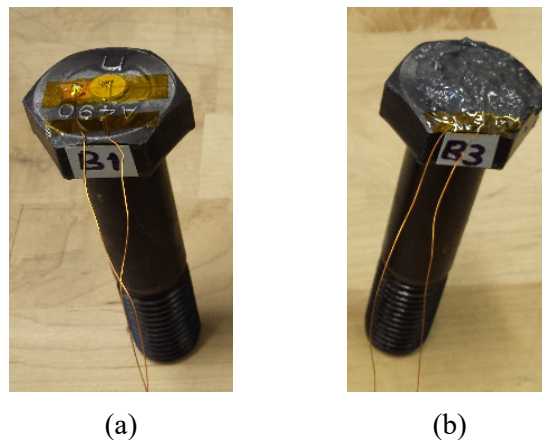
Piezoelectric instrumented bolts with (a) no protective coating, and (b) ES39-6 epoxy protective coating.
